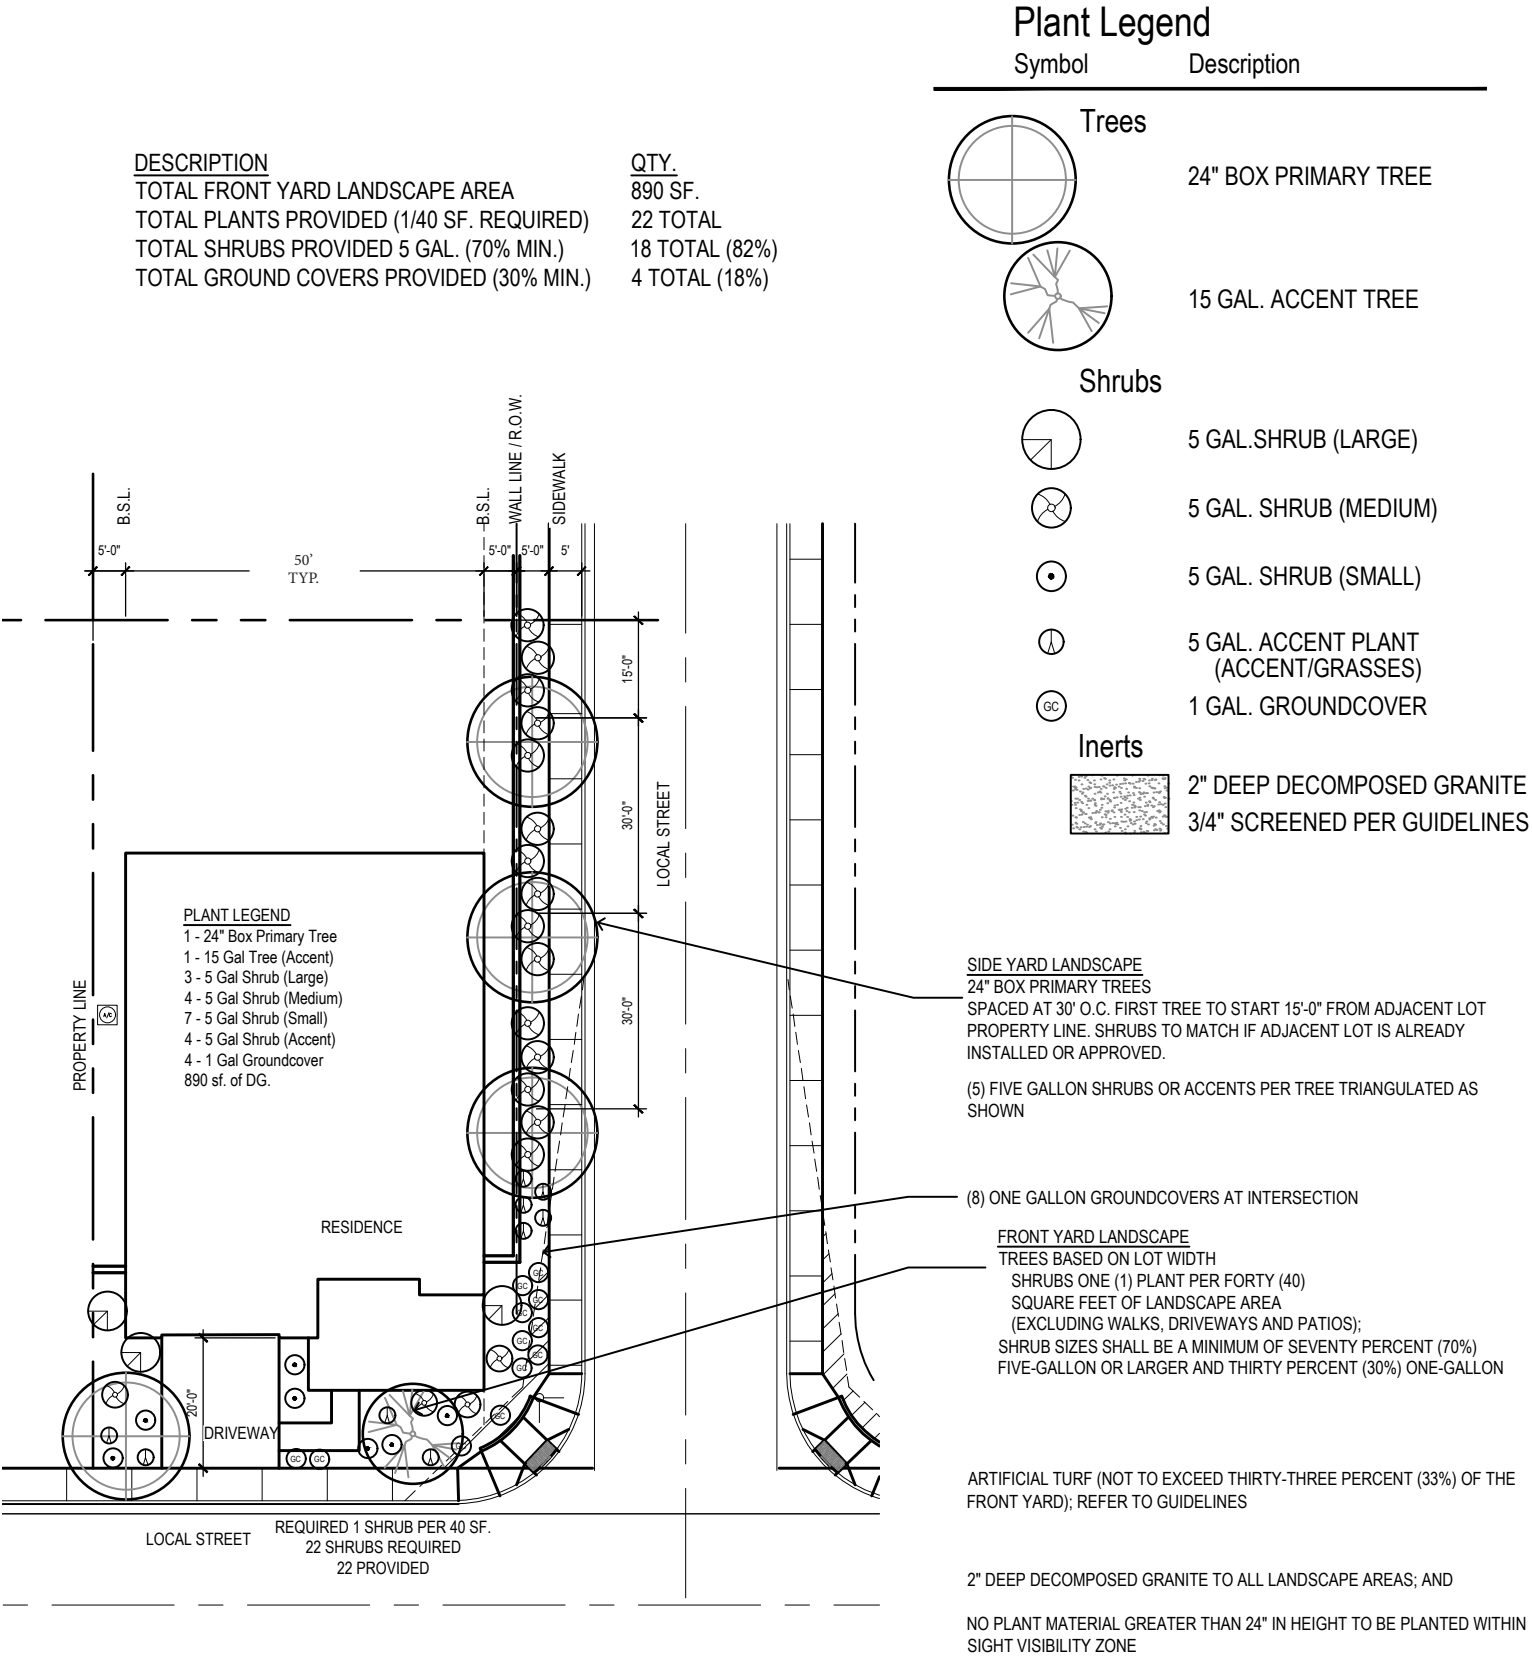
N.2: TYPICAL FRONT YARD LANDSCAPE (50' WIDE)
